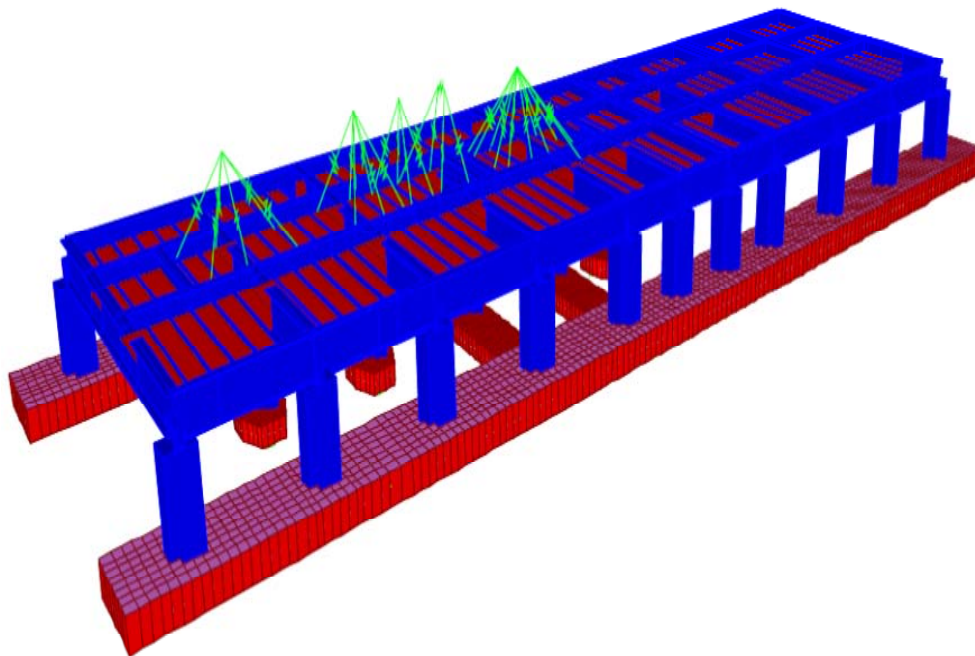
Model of foundation and mounted vibrating equipment for first stage analysis
